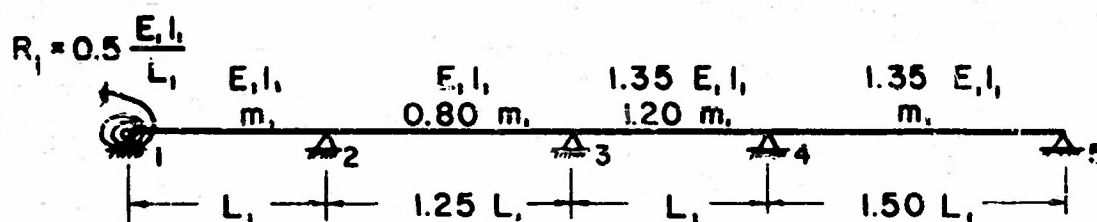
BEAM CONSIDERED IN EXAMPLE 2
